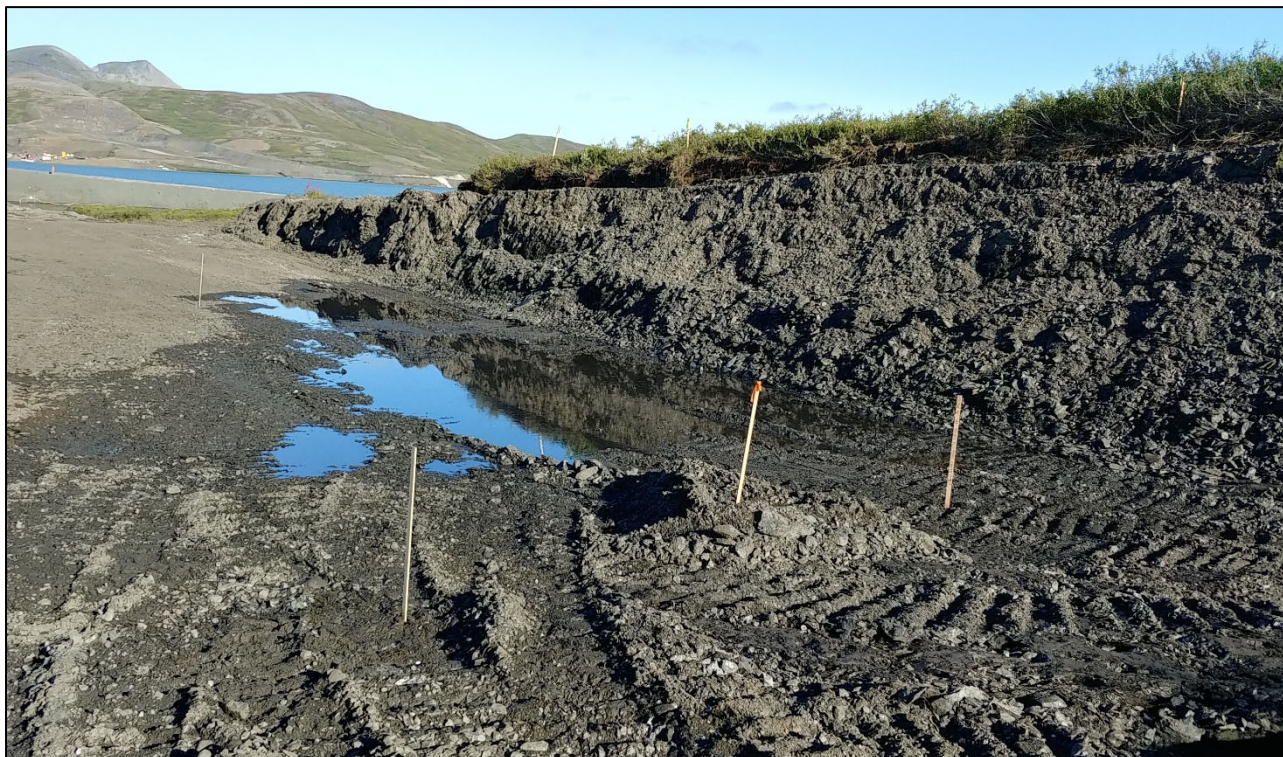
Downstream slope near Sta. 22+50 (looking west)
